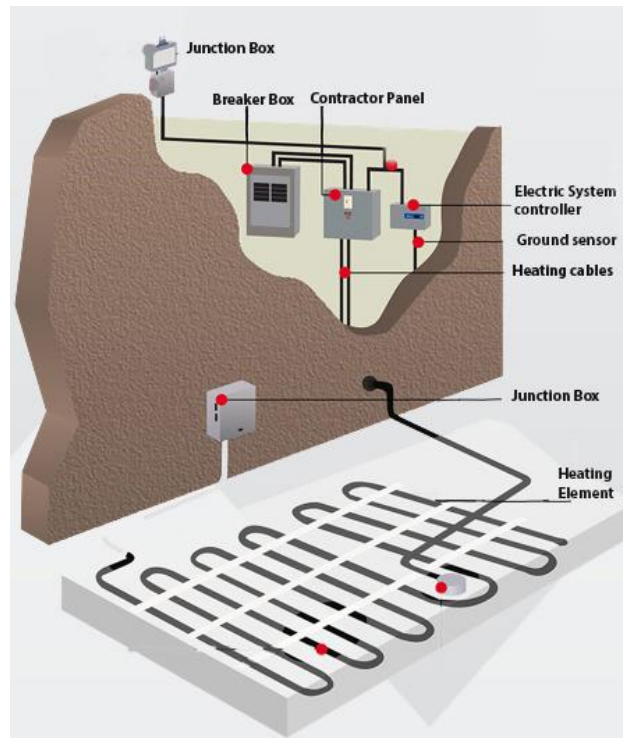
Electric underfloor heating system (Floor Heating Guide, 2022)
